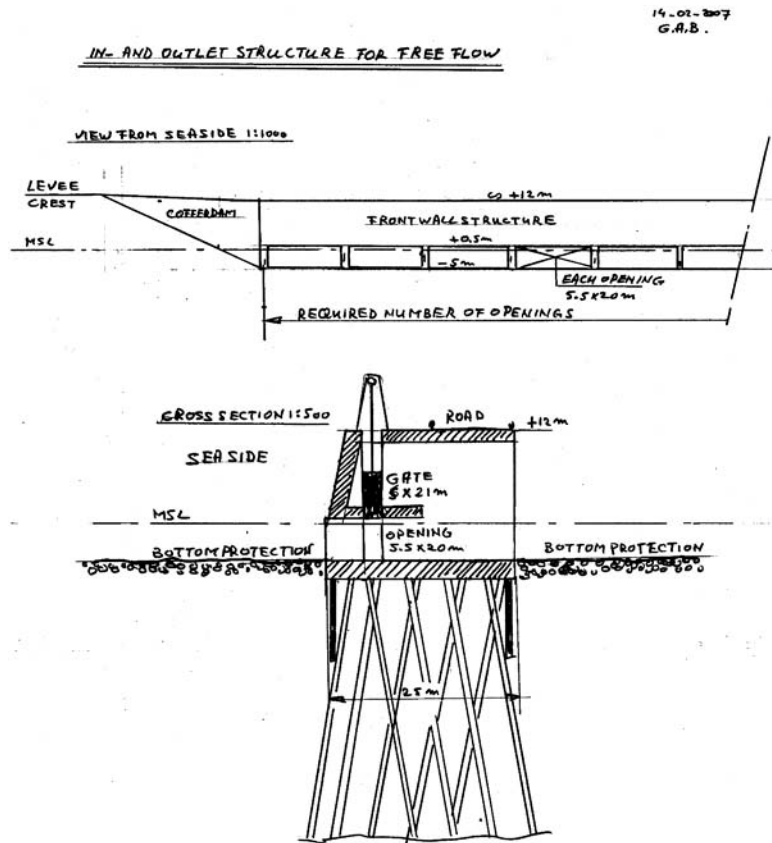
Top view and cross section of an in- and outlet structure, only to be closed during extreme events.
